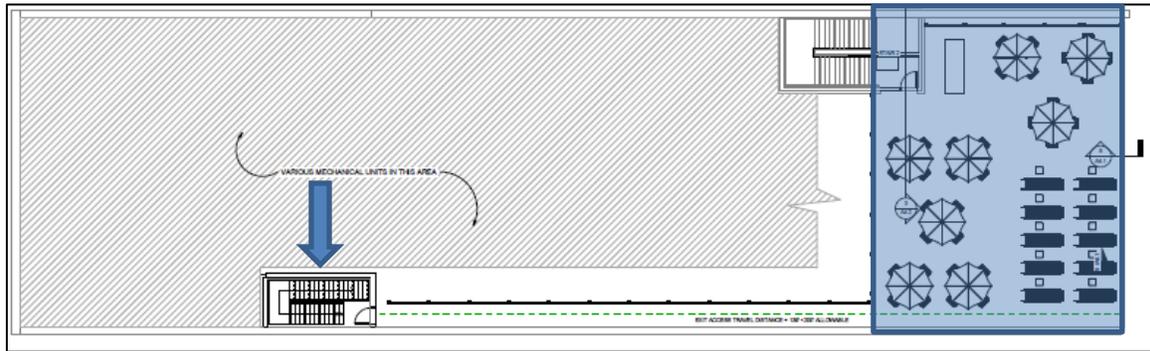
Building plans showing the new stairwell addition and rooftop deck space recently constructed.
